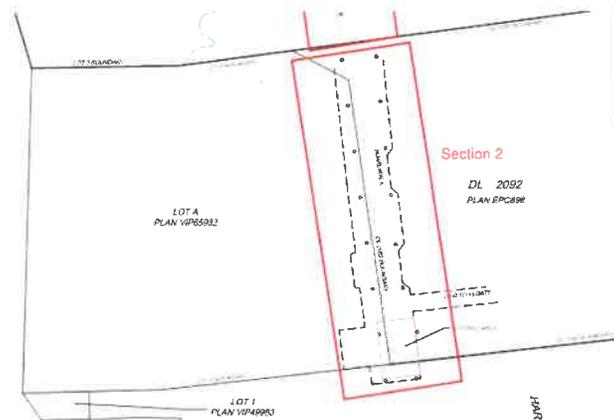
Location of boardwalk section 2 (see Appendix B for Land Survey)
